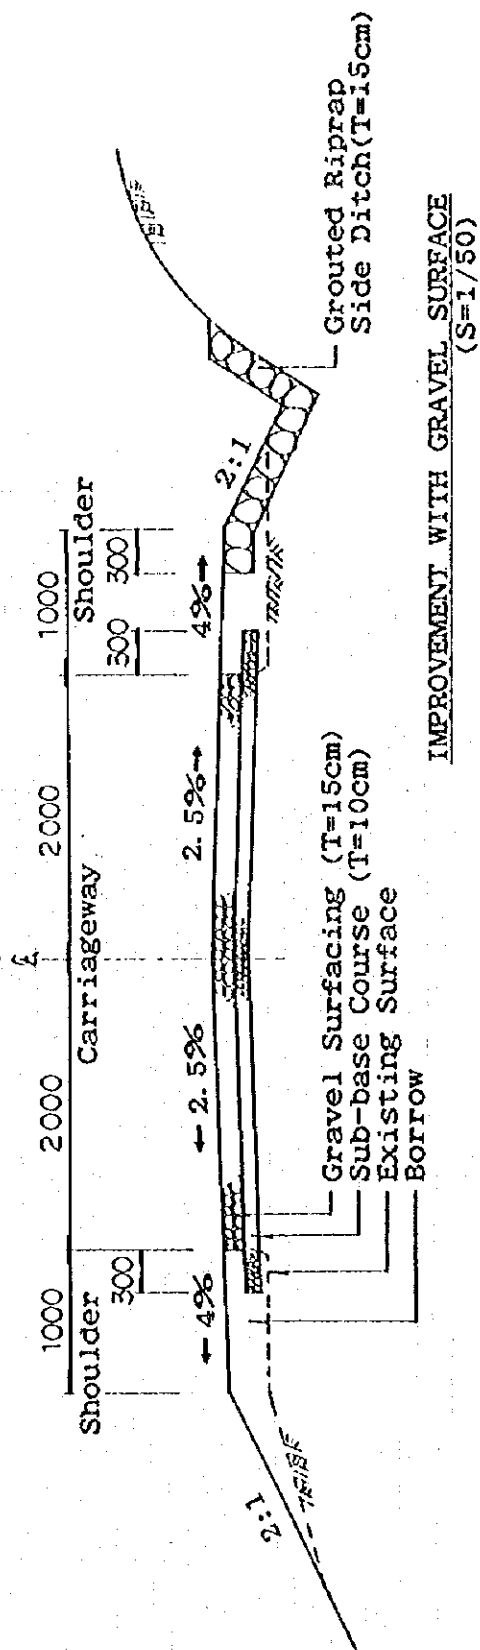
STANDARD CROSS SECTION OF BARANGAY ROAD
